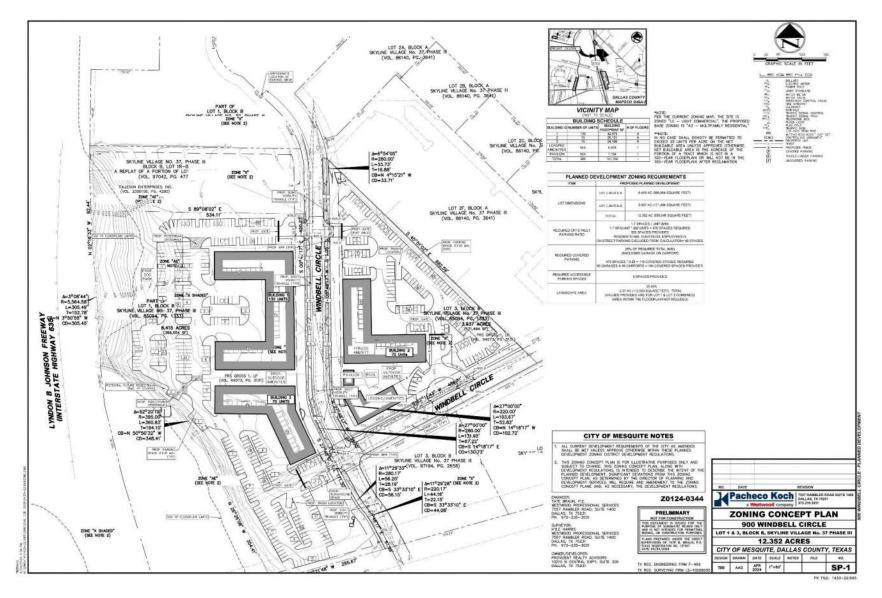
EXHIBIT C - CONCEPT PLAN - FILE NO. Z0224-0344
